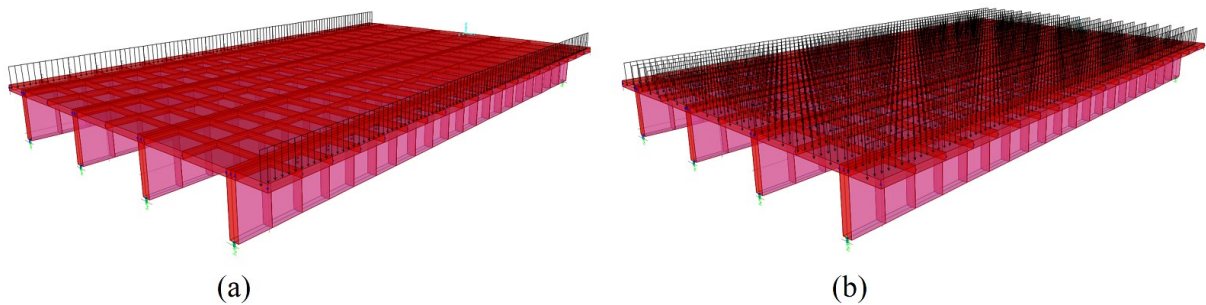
Loading: (a) Guardrails; (b) Pavement.
